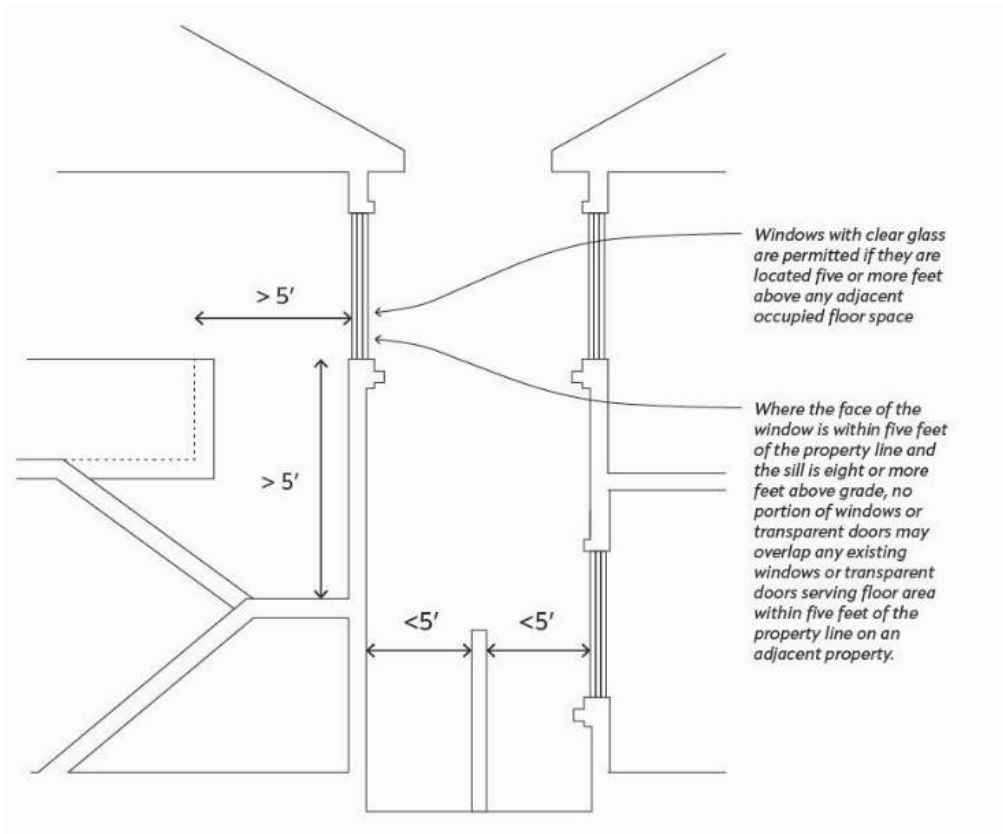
(A)(2)(a)-B: Window and Balcony Placement and Design
